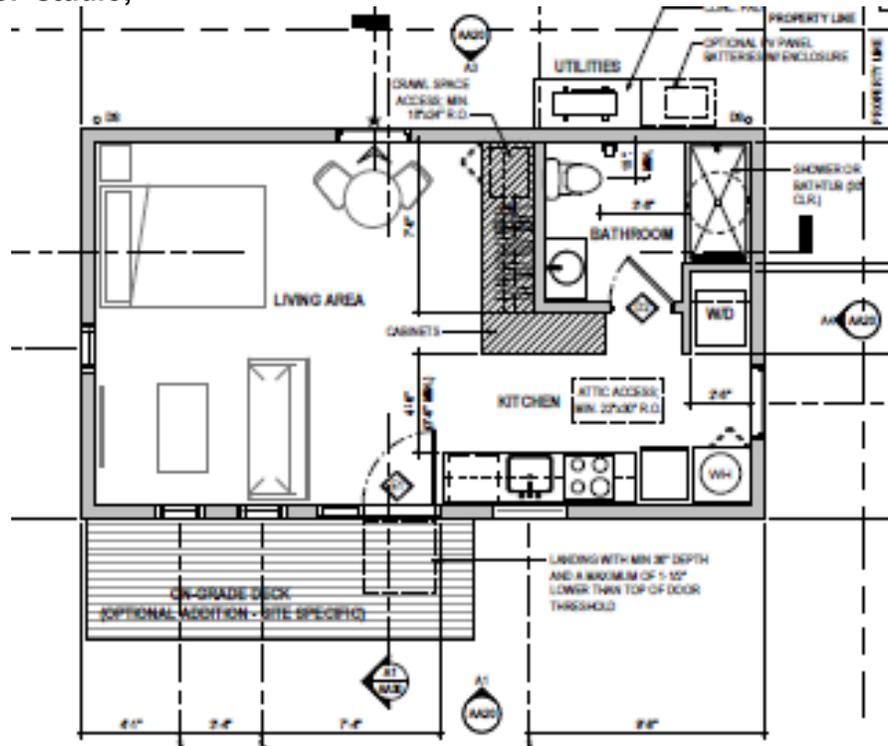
Studio ADU Floor Plan (HEART GLADUR Plans Sheet AA11)
